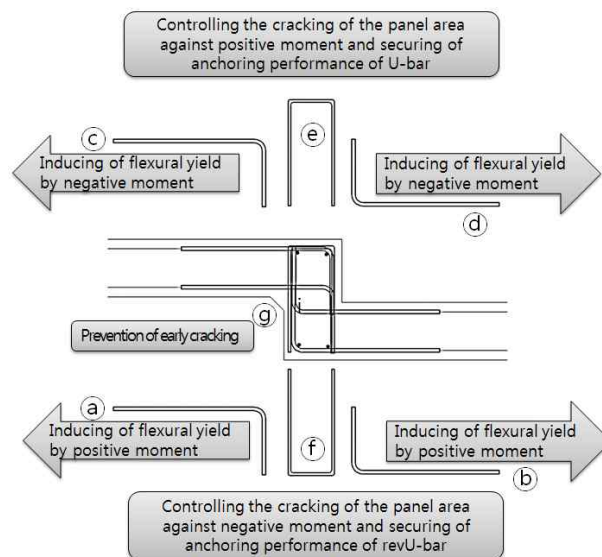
Concept drawing of rebar placement at the step area
